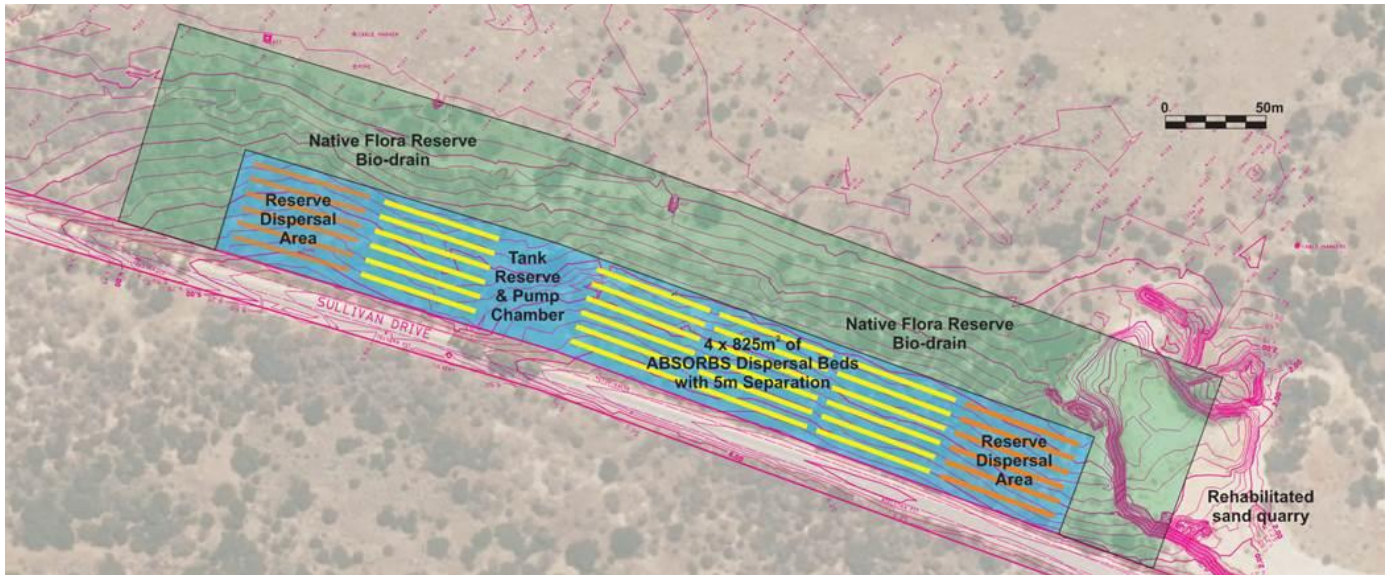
Design plan and layout of the of the waste water dispersal facility.
